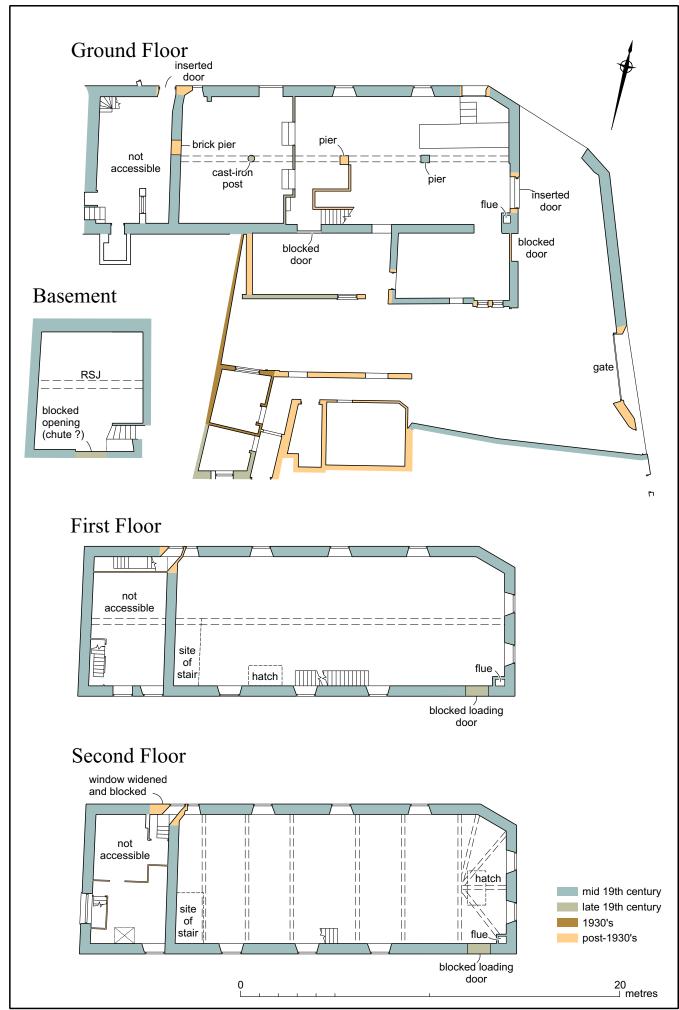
Floor plans, based on Studiojob Architectural Services Ltd drawing P316-01.
